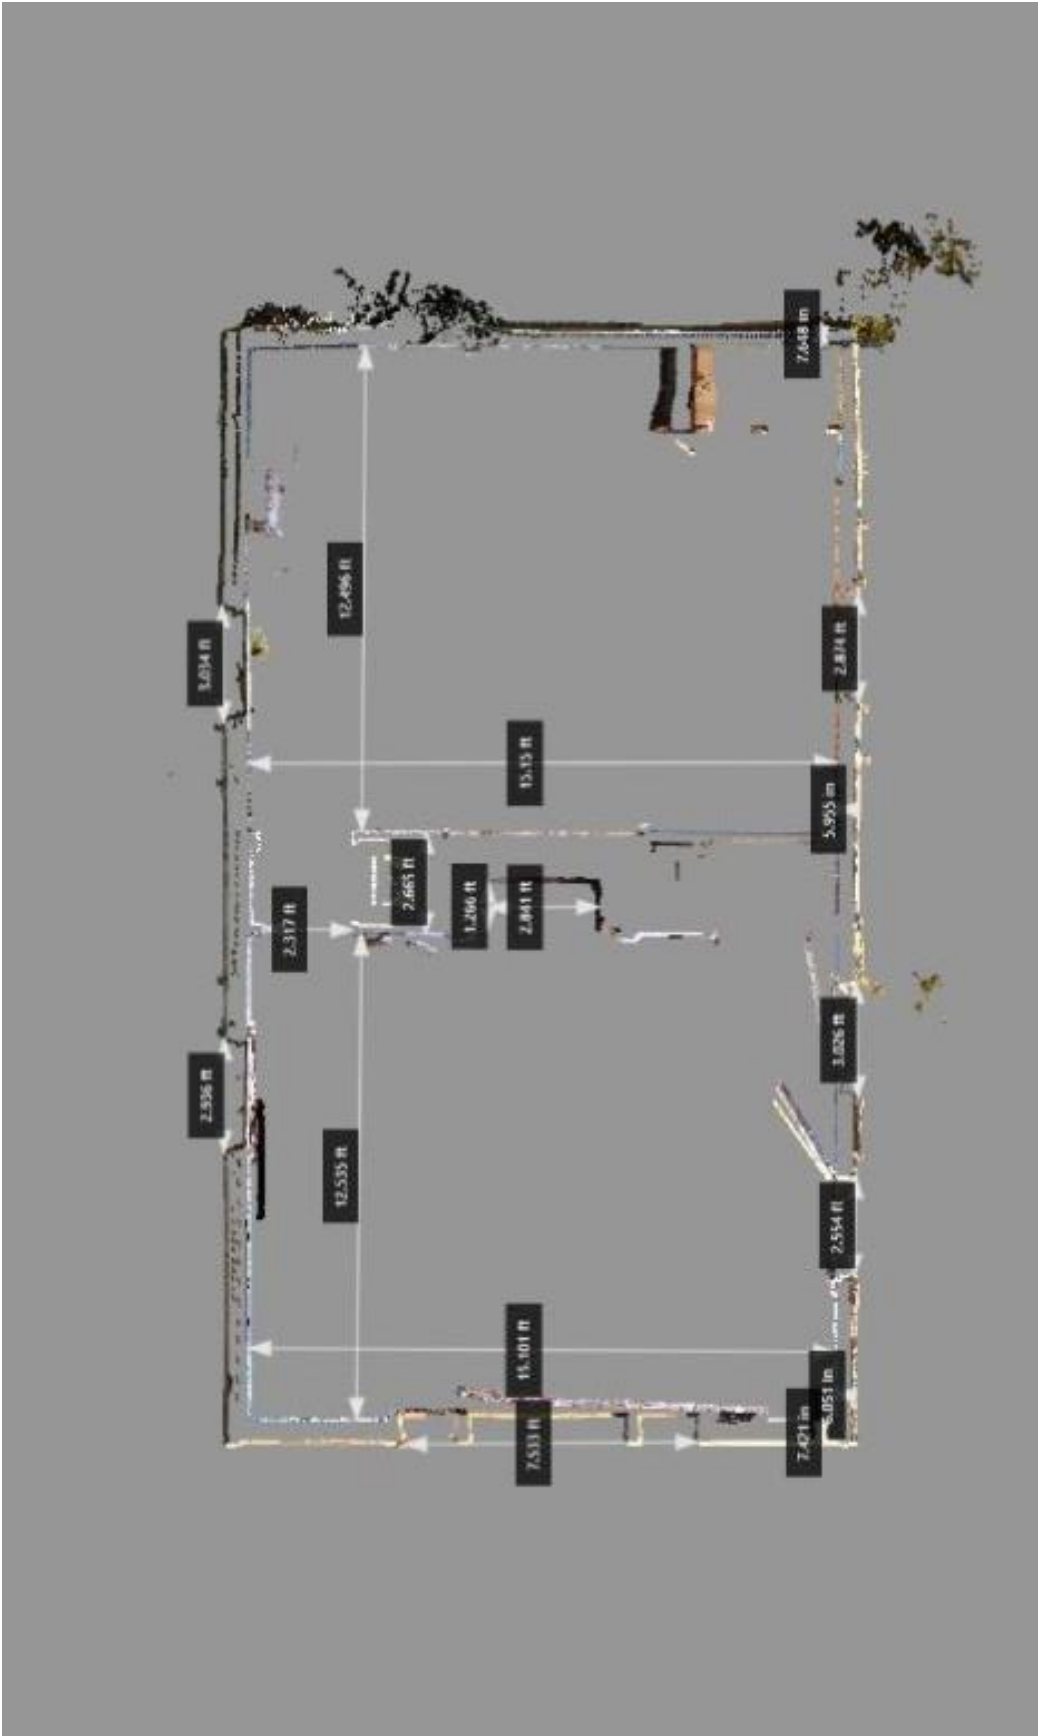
A view of the first-floor plan of the outbuilding with measurements drawn from the 3D data.
